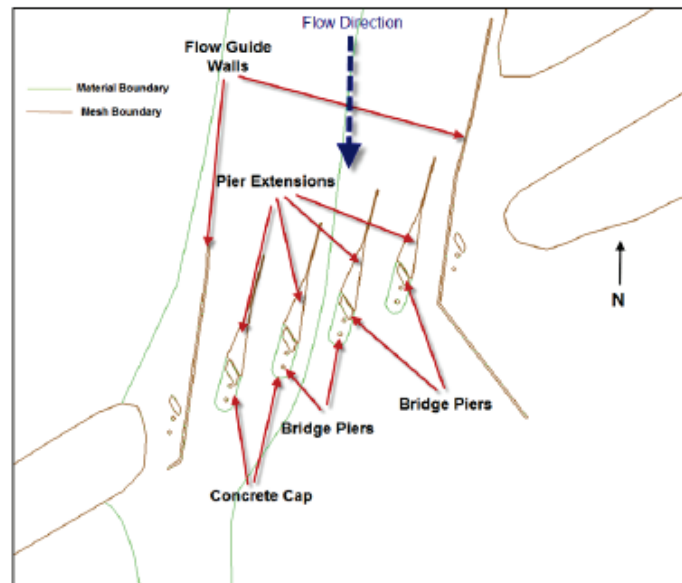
Burlington Northern Santa Fe Corporation railroad bridge crossing on the Santa Ana River near Corona, California.
